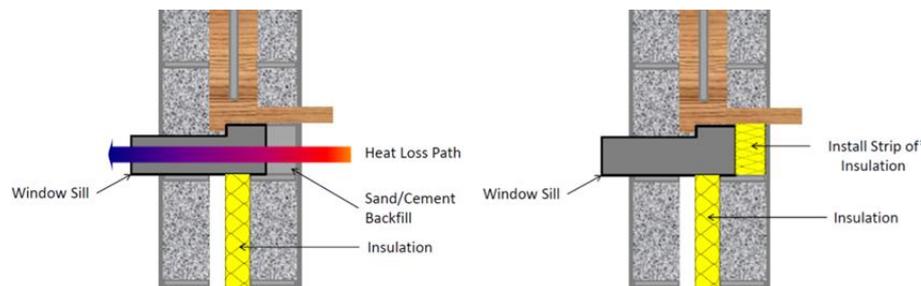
Cavity Wall Sill Detail showing Thermal Bridging and solution
